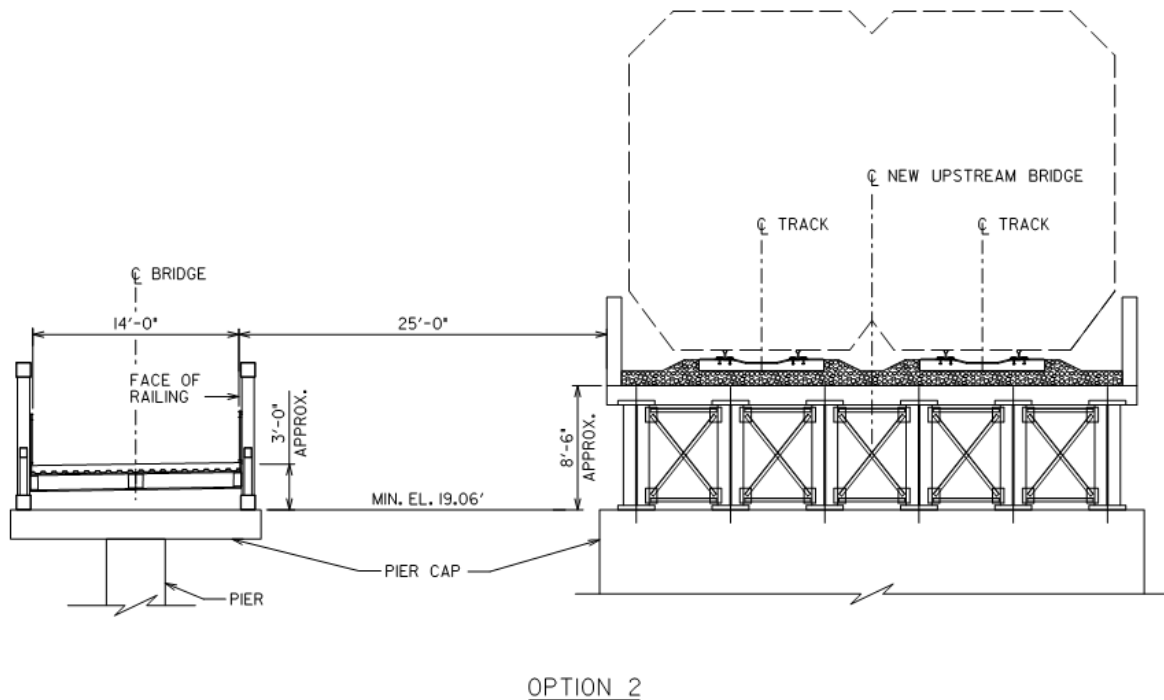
| Section Diagram of New Upstream Railroad Bridge and Bike-Pedestrian Crossing Option 2
